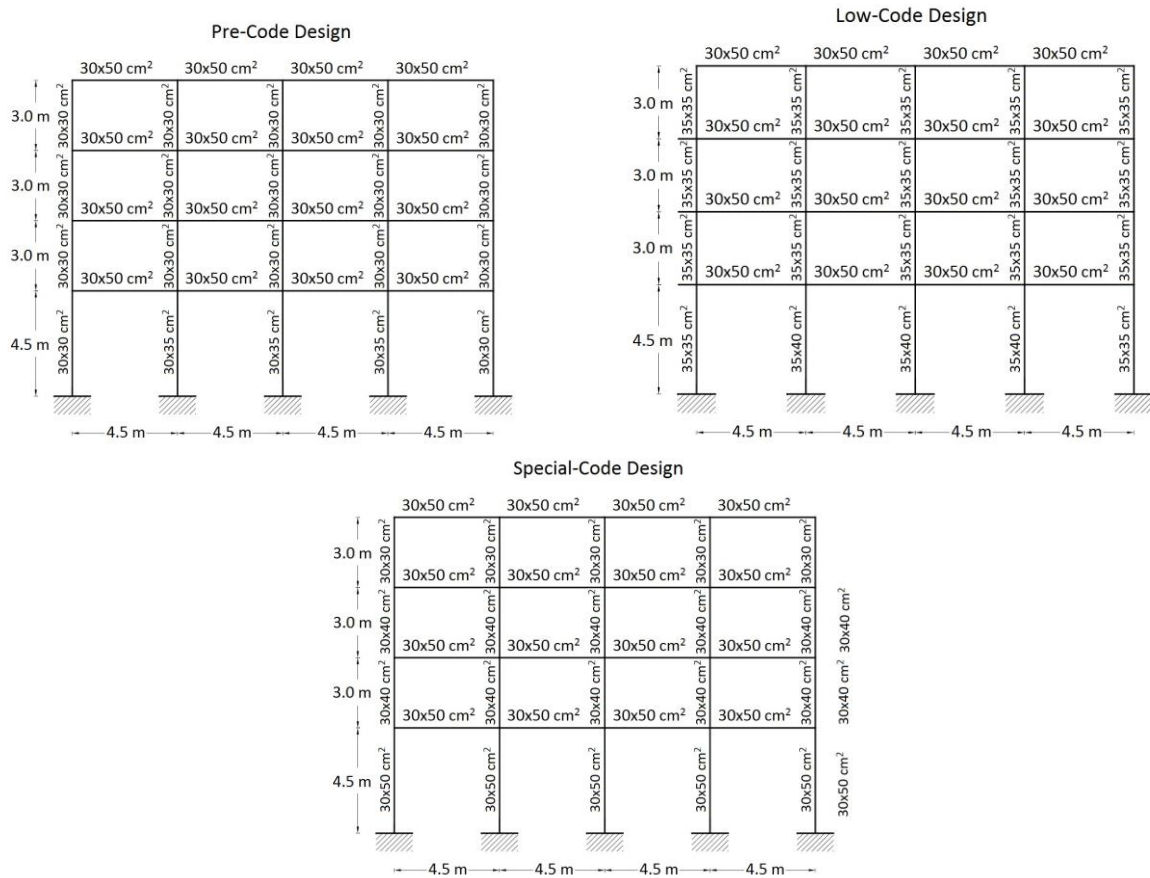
Elevation dimensions and member cross-sections of the considered RC frames.
